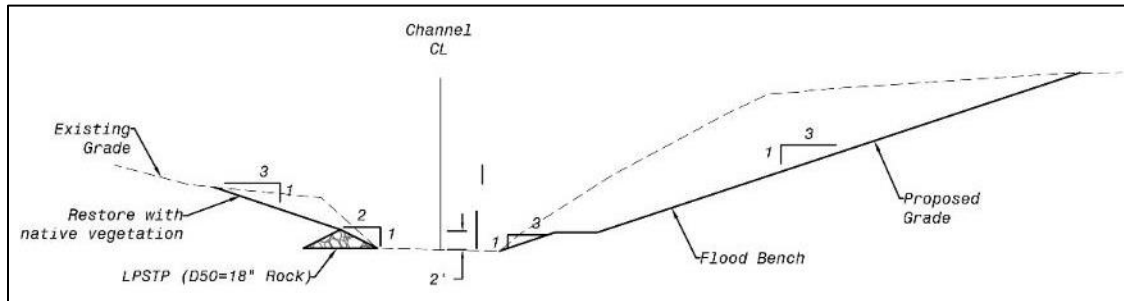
Typical Cross Section of a LPSTP Structure and Flood Bench.
